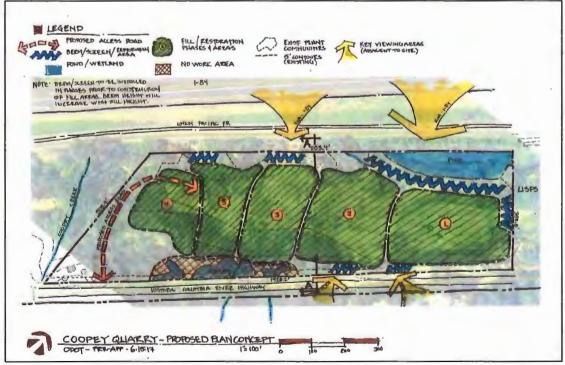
Proposed Plan Concept at Coopey Quarry showing location for the access road at west end of the quarry.
